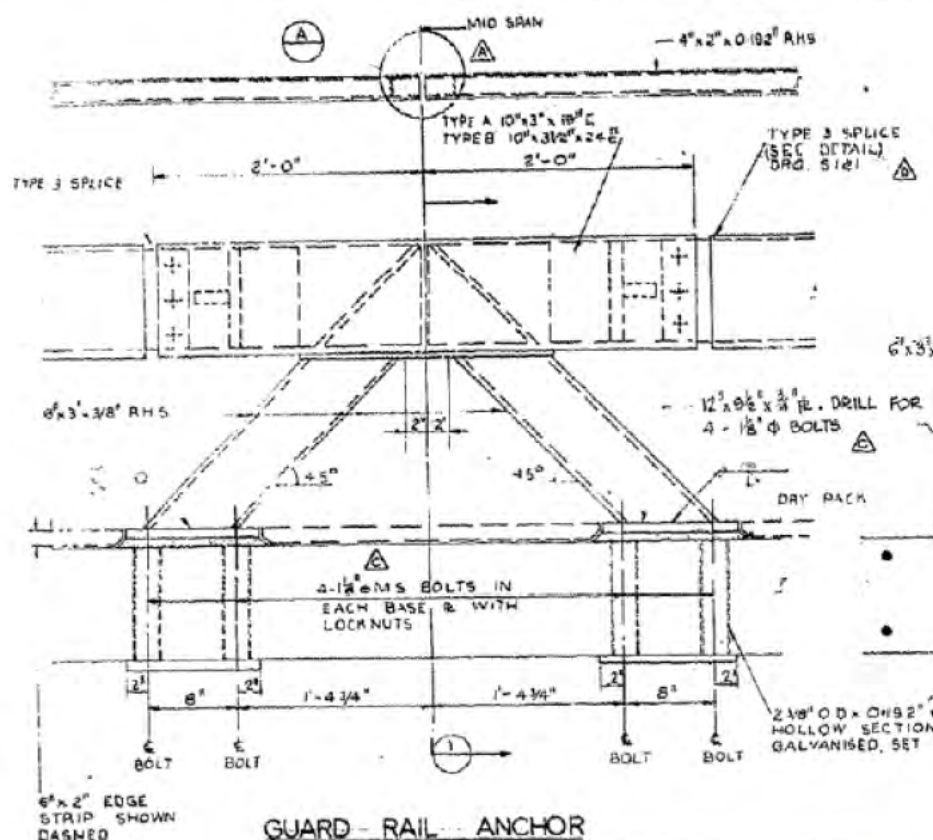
Shell Gully Overbridge - Anchorage Detail from Construction Drawings (Designed in 1974)
